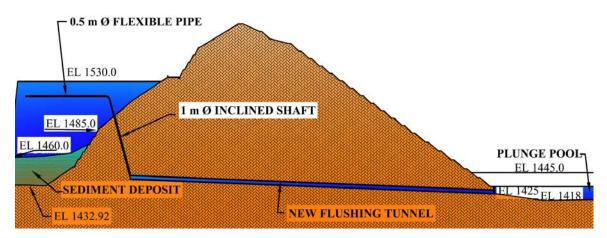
Longitudinal section of HSRS layout with new tunnel (Alternative 2)
